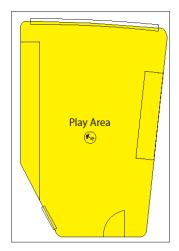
Levine 8th floor Play Room Plan. Not to scale.
